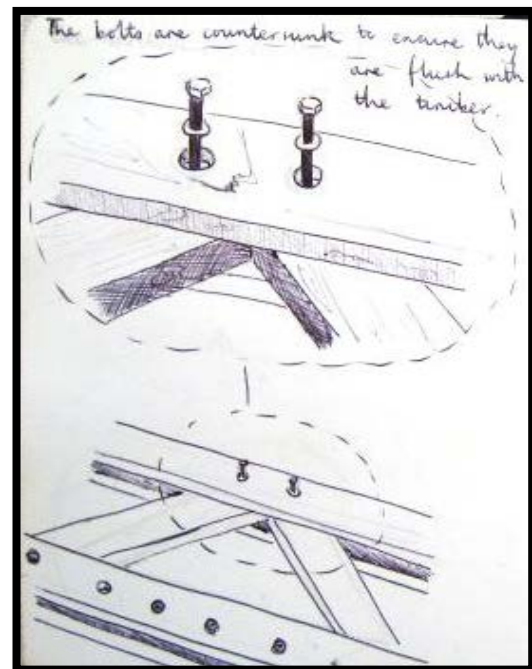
The method of compiling and linking the timber roof trusses (Holley, 2011).
